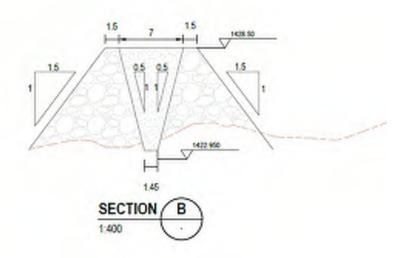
Coffer Dam Section of Embankment, Including Clay Core
